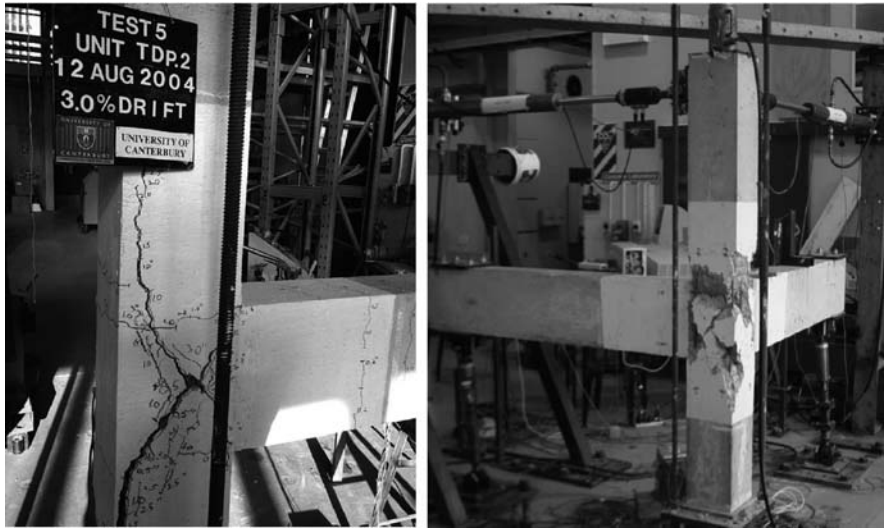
Damage observation in the as-built exterior beam-column joint specimens 2D and 3D subjected to uni- and bi-directional loading, respectively (after [25, 27])
